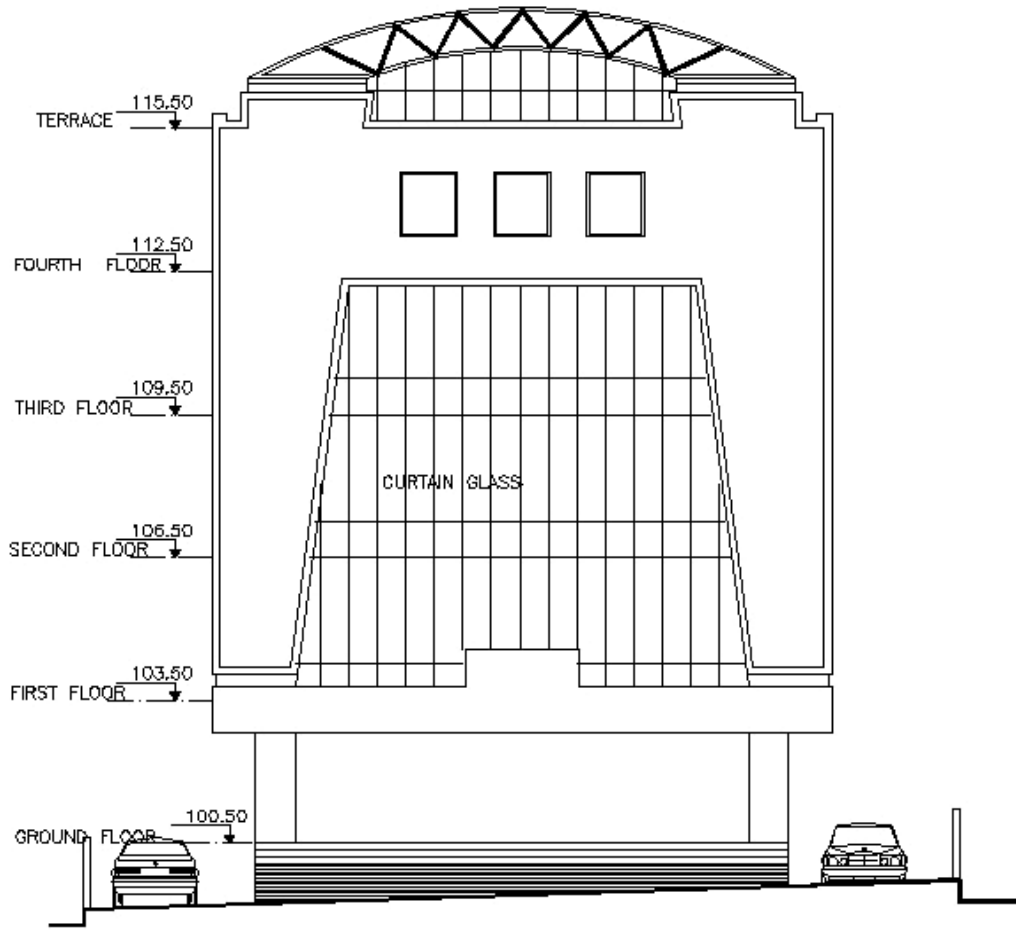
Mahavir Commercial Complex: North side Elevation
